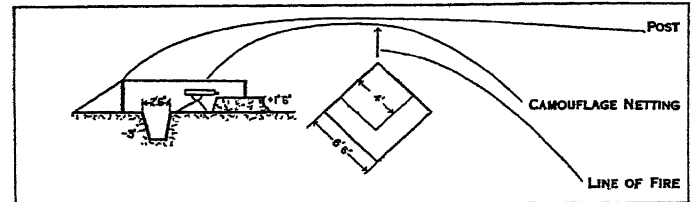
MACHINE GUN EMPLACEMENT IN THE OPEN
